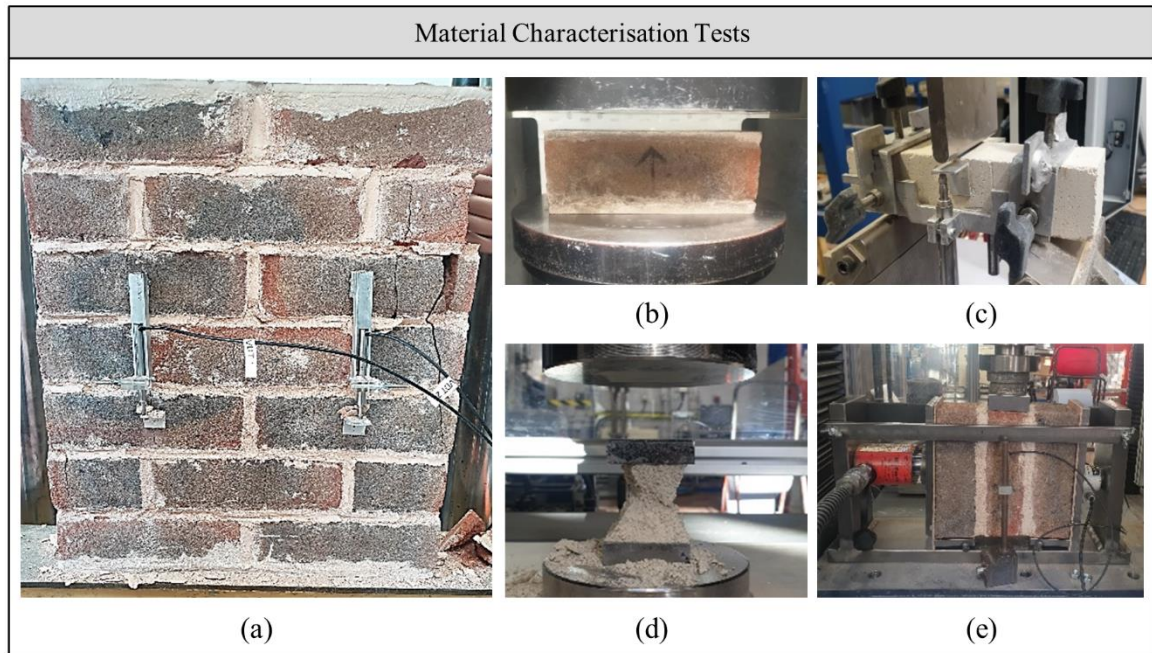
Overview of material characterisation tests: (a) compression tests on masonry wallettes; (b) compression tests on brick units; (c) flexural tests on mortar prisms; (d) compression tests on mortar prism halves; (e) shear tests on masonry triplets.
